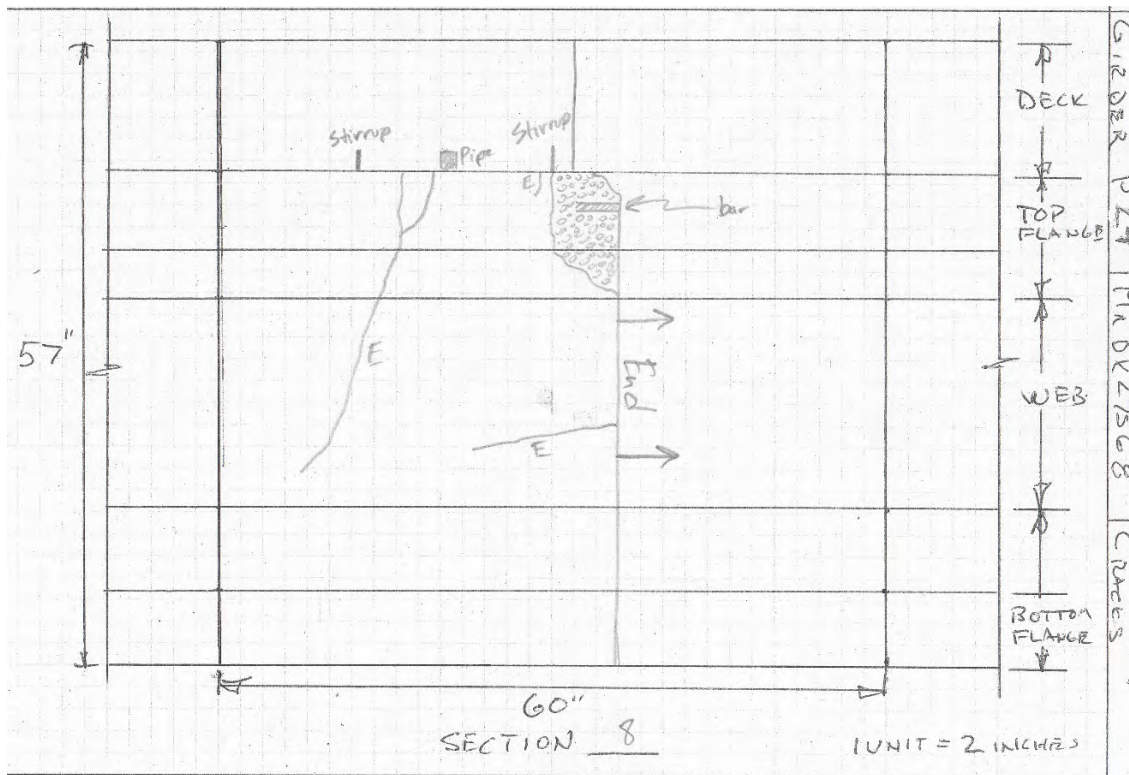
Girder P24 crack pattern – Section 8
